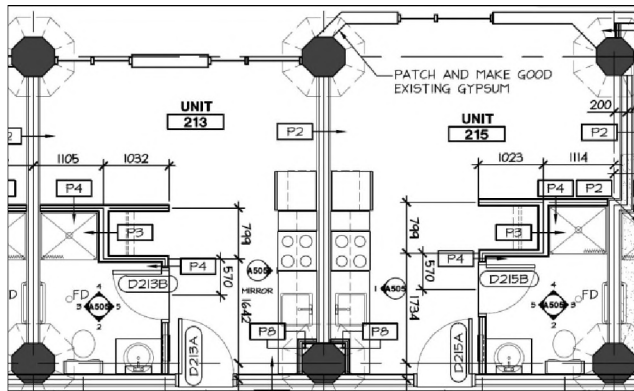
; Floor Plan Units 213 and 215 Showing Test Wall
